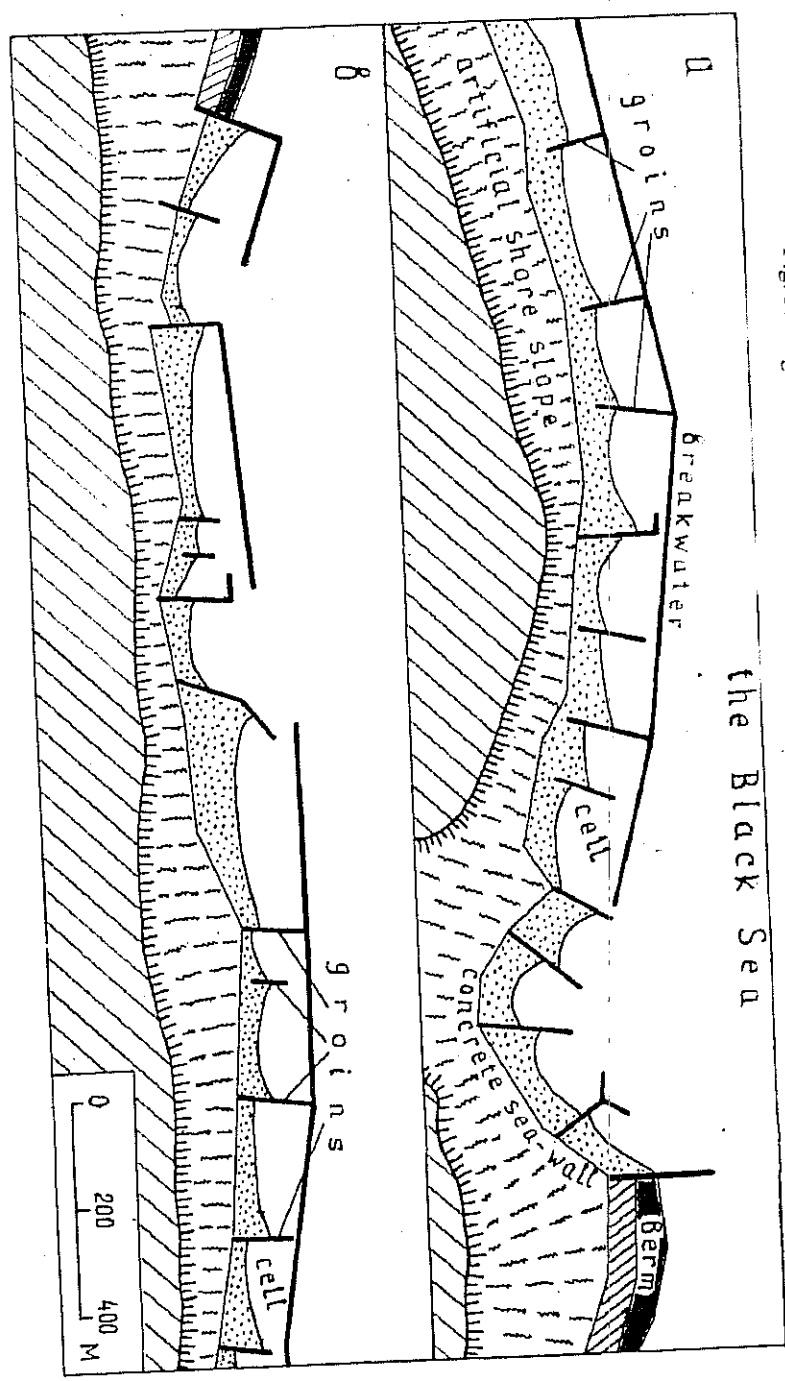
Fragments of coast protecting construction: a - first stage of construction; b - second stage of construction.
